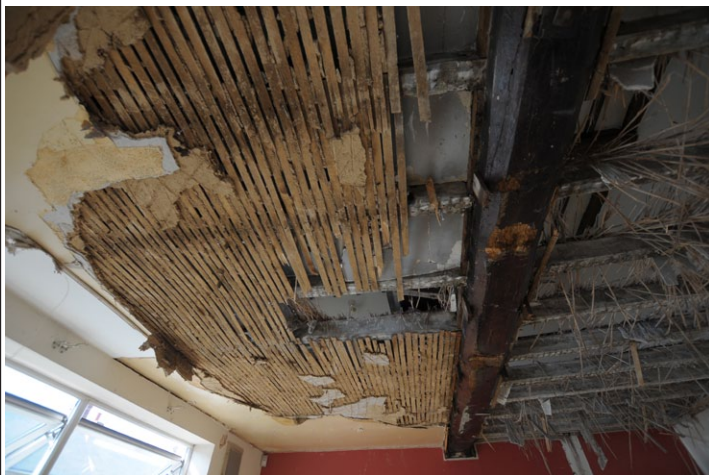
Shot of original beam in ceiling, ground floor (west side) Unit 1, looking west
